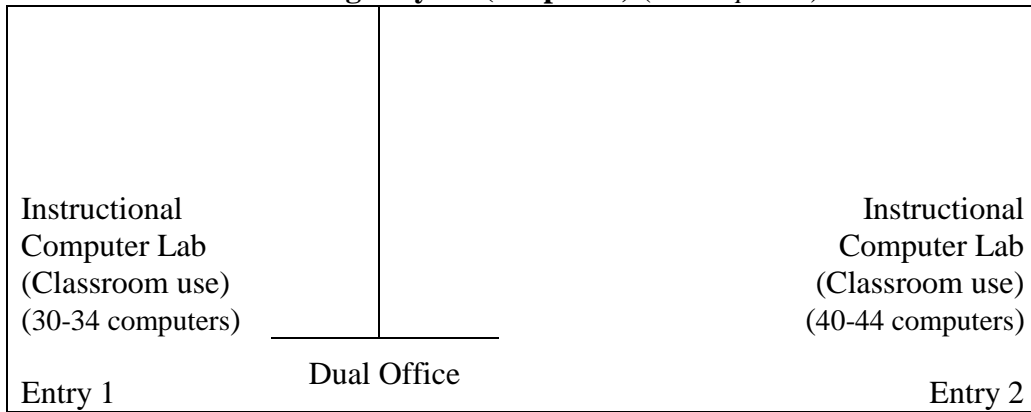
Floor Plan for 2500 bldg. (Current and Proposed)
